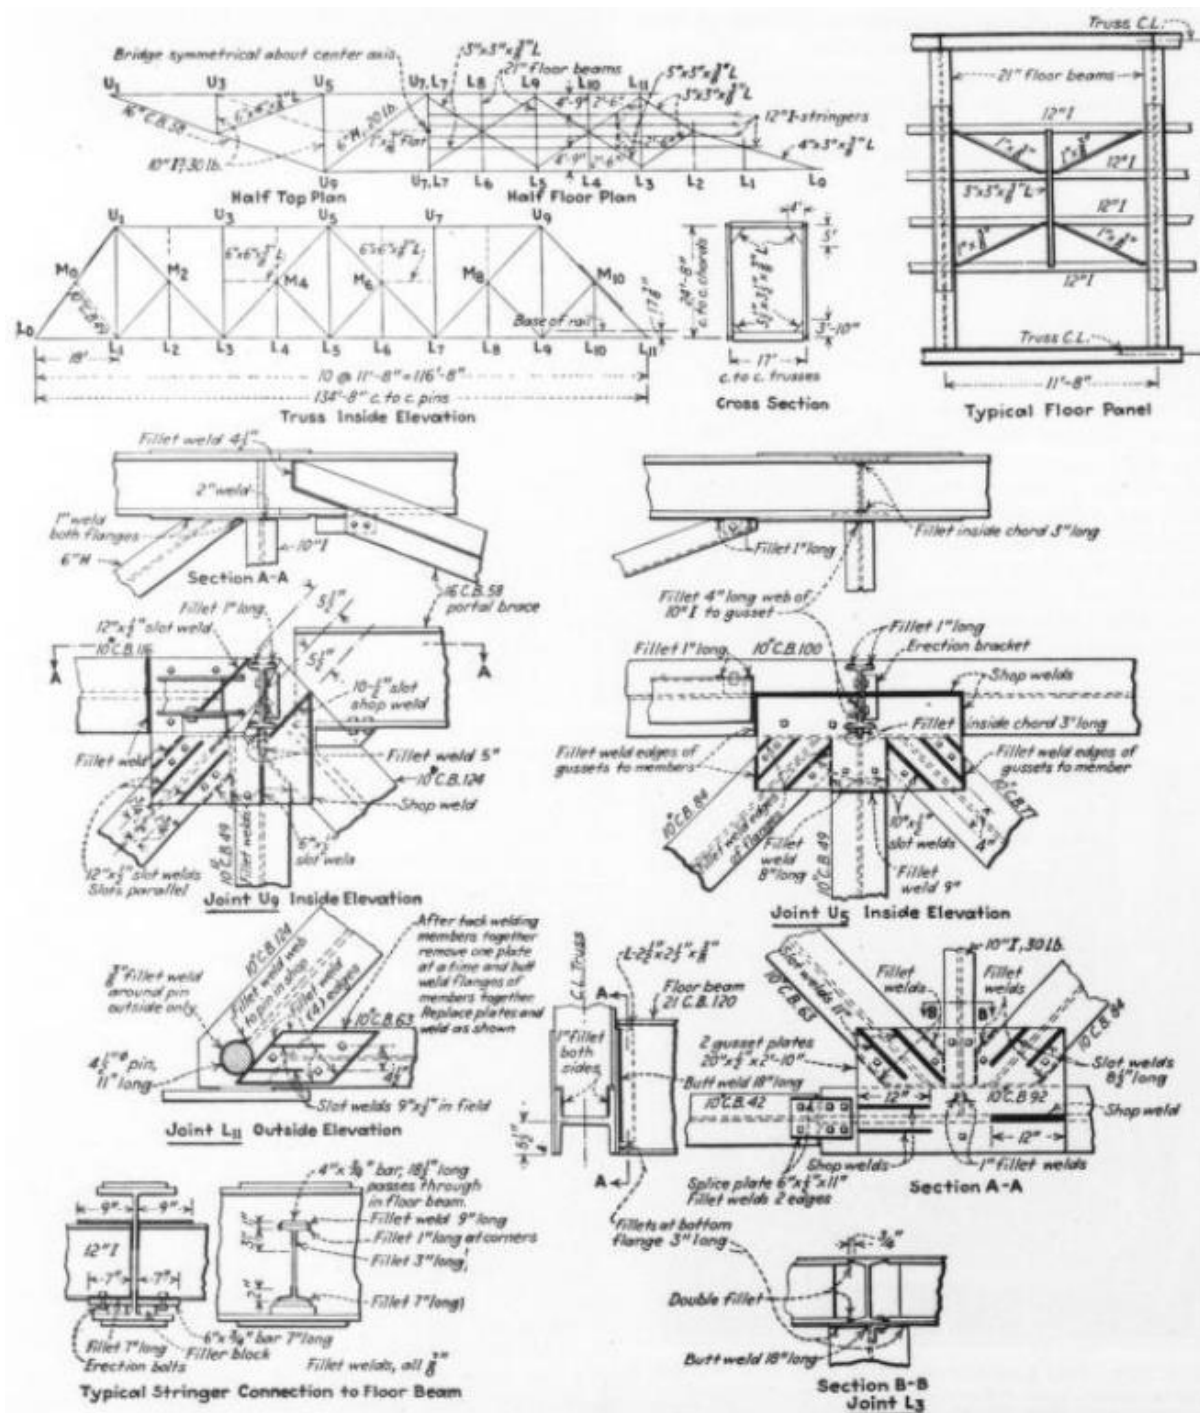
Details of arc-welded Through-Truss Railway Bridge, Chicopee Falls, Massachusetts (Fish, 1933).
